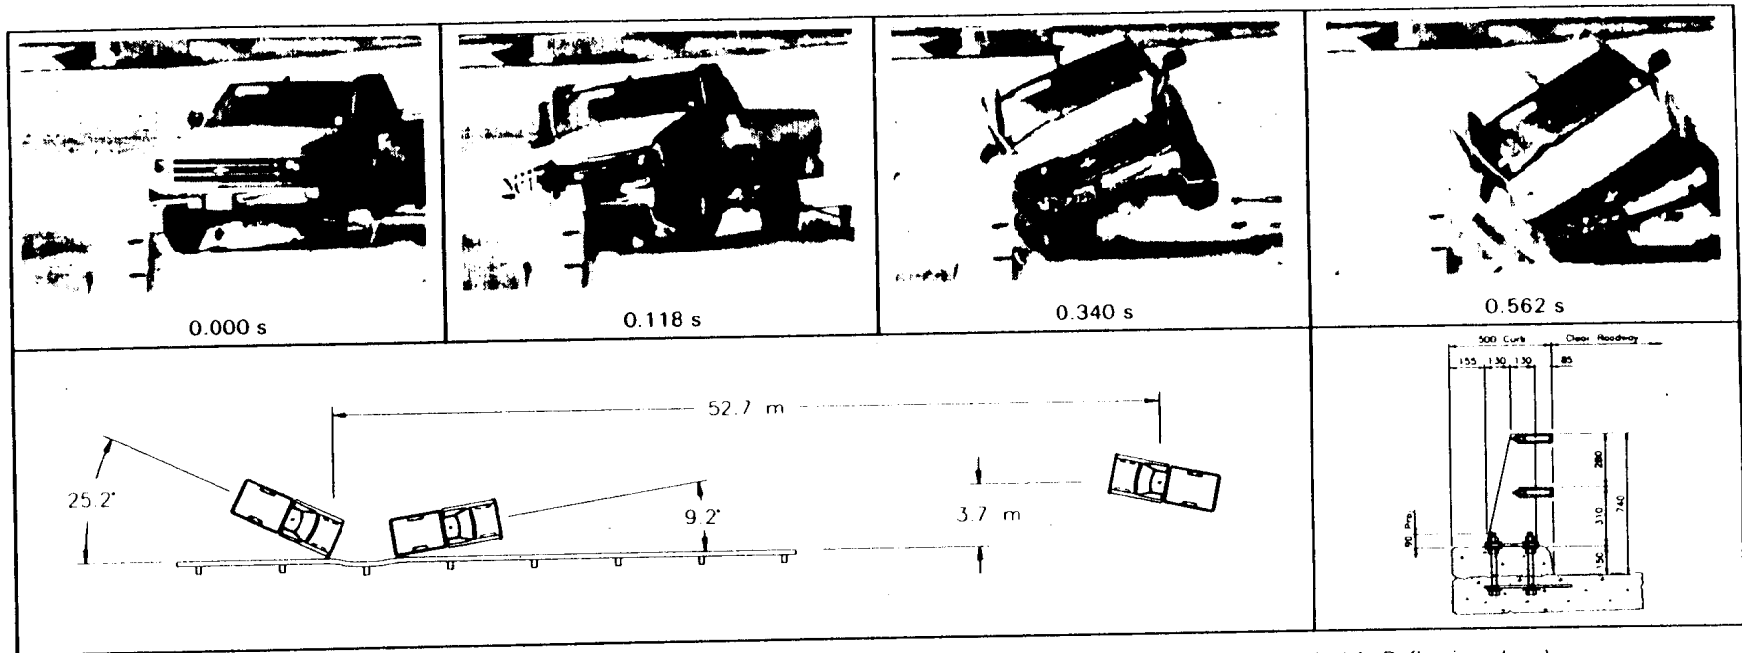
Details of the Wyoming 740WYBRIL bridge railing elements.
